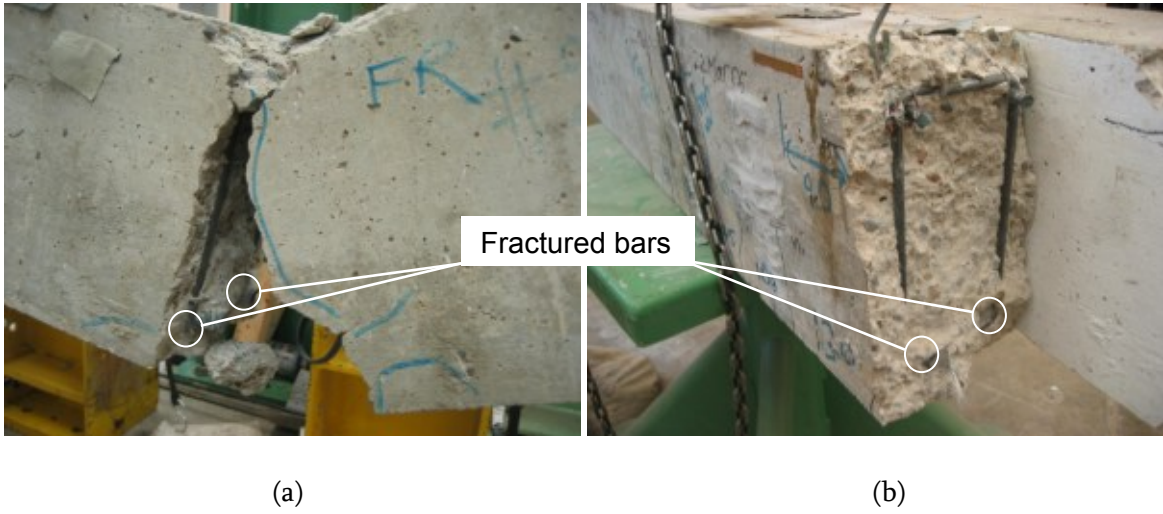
Typical failure of the SL20-group of beams: (a) fatigue fracture of both reinforcing steel bars, (b) failure occurring at the crack location in the vicinity of a stirrup
